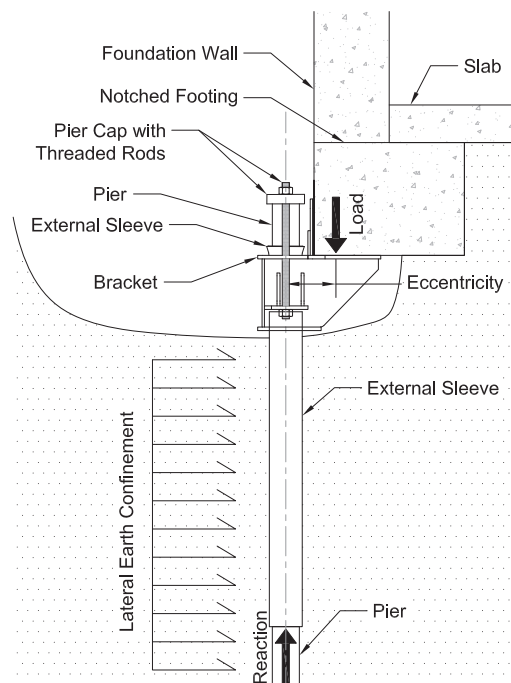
External sleeve and pier bear against confining soil when system is under load
